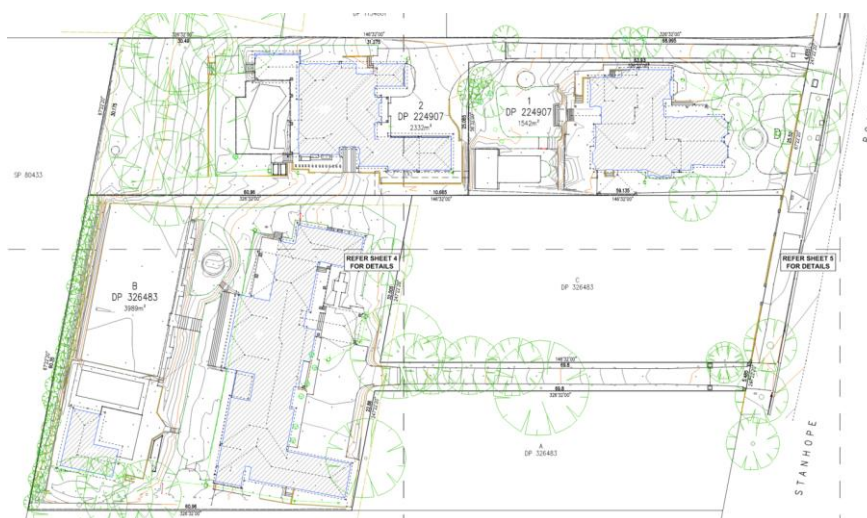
Survey plan illustrating the slope of the site (Source: TSS)
